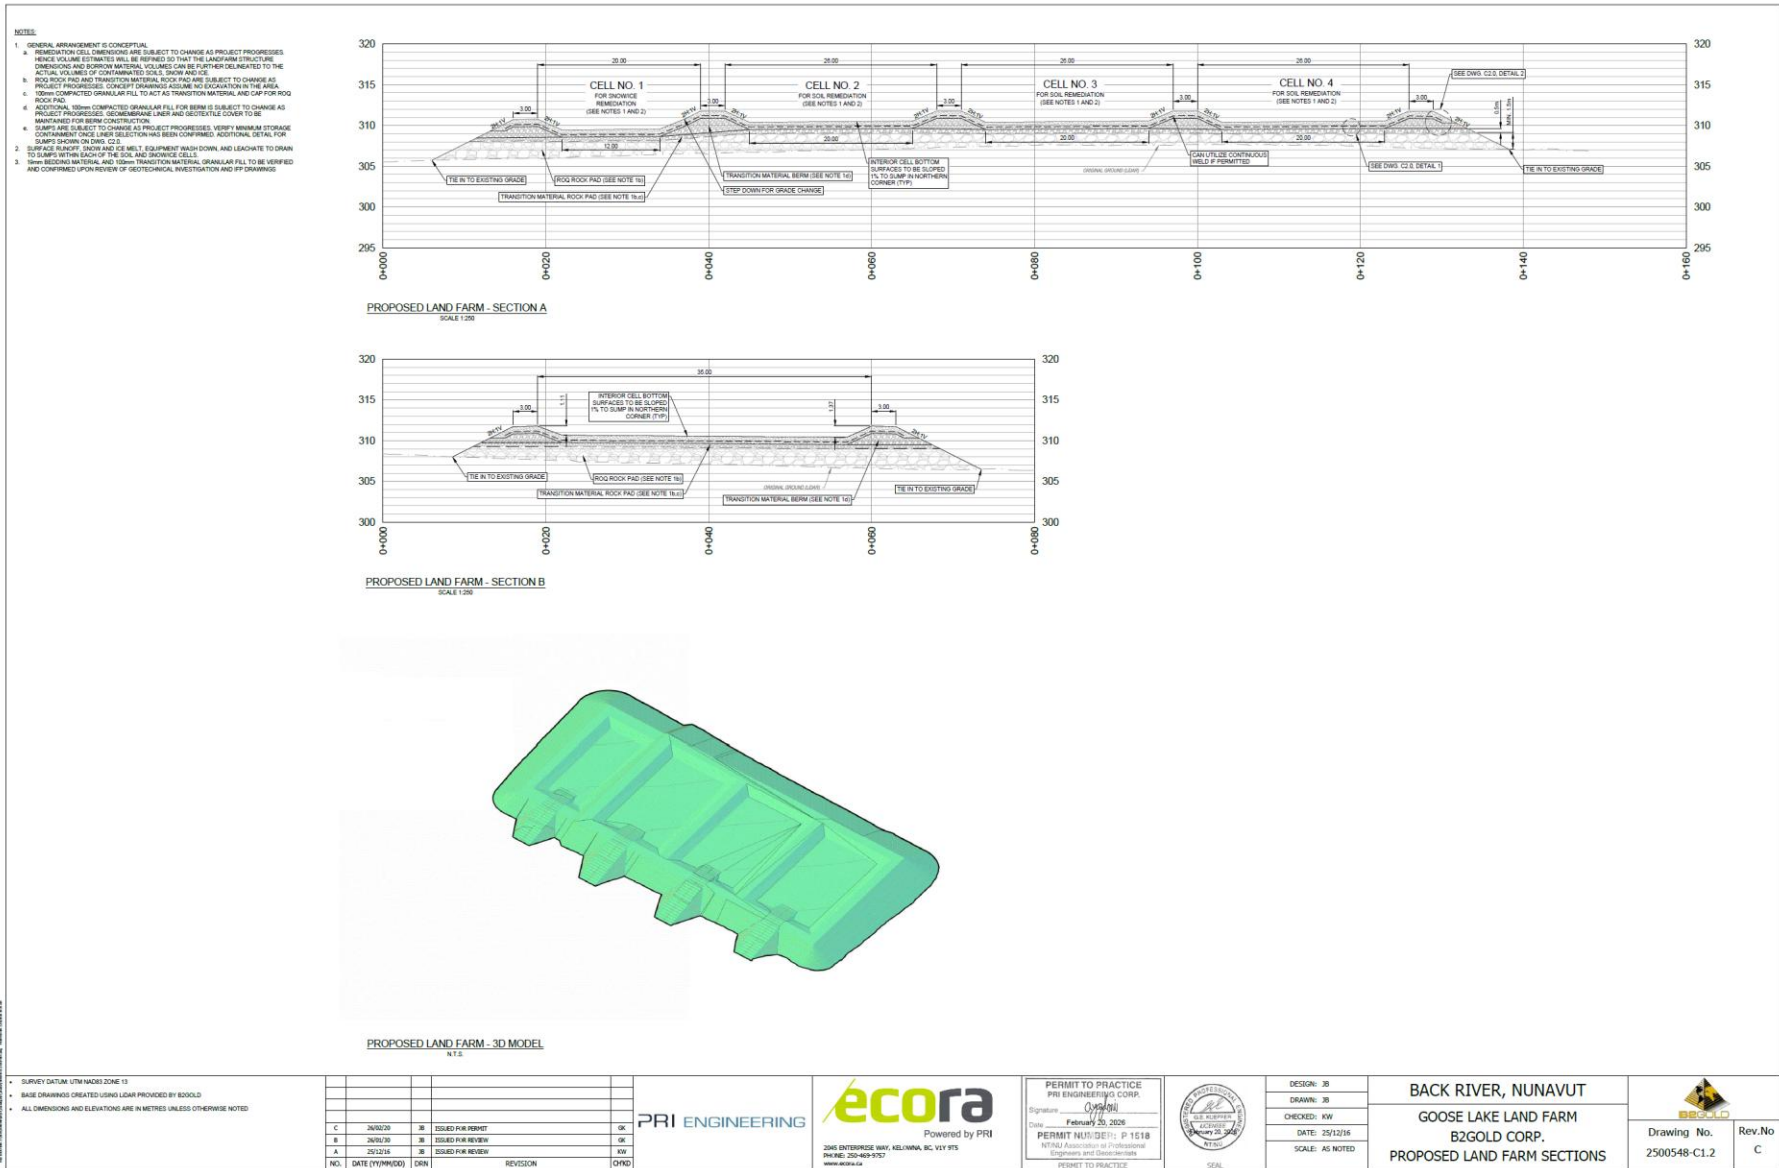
Goose Mine Land Farm / Soil Treatment Facility Proposed Sections
